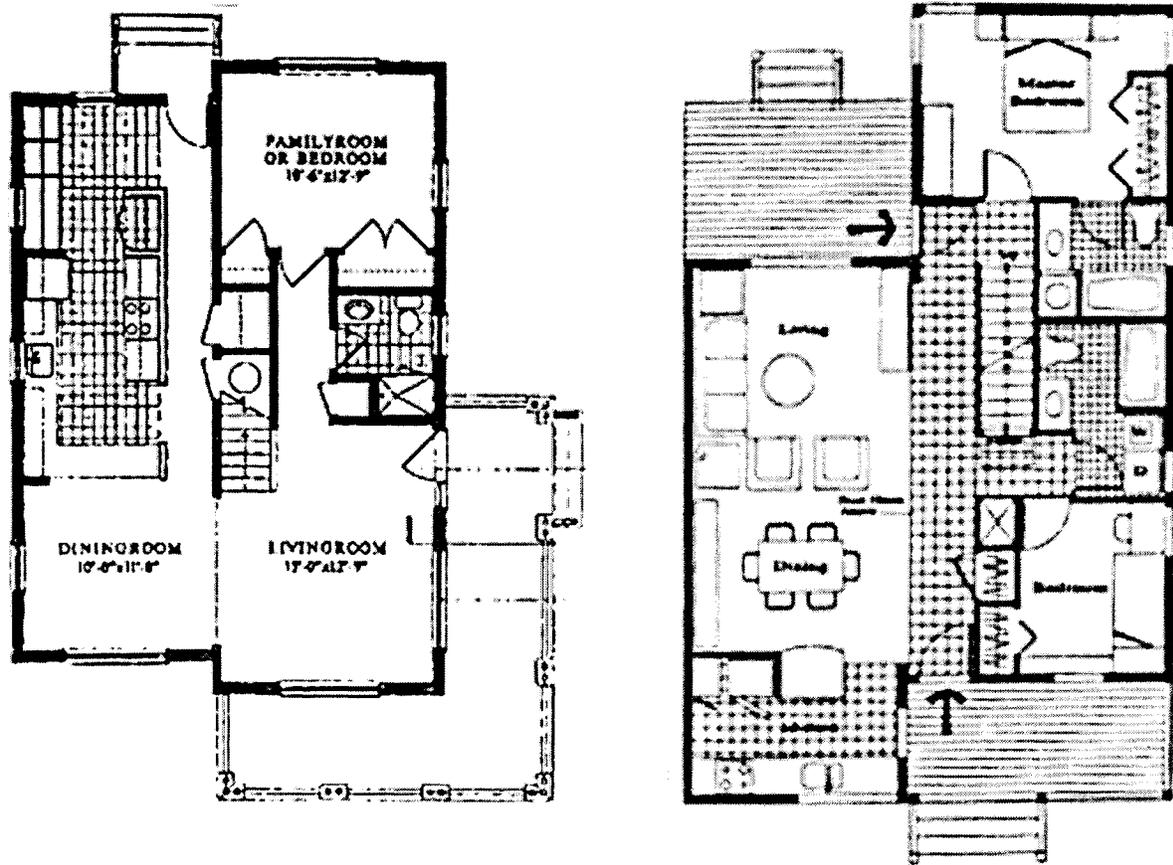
Prototypes for two-story manufactured homes for inner city neighborhoods: the New Era Building Systems plan (left), and The NextGen plan (right). Compare the plan of the New Era house and the NextGen plan with the New Manufactured House and Wright's Duplex Flats.
